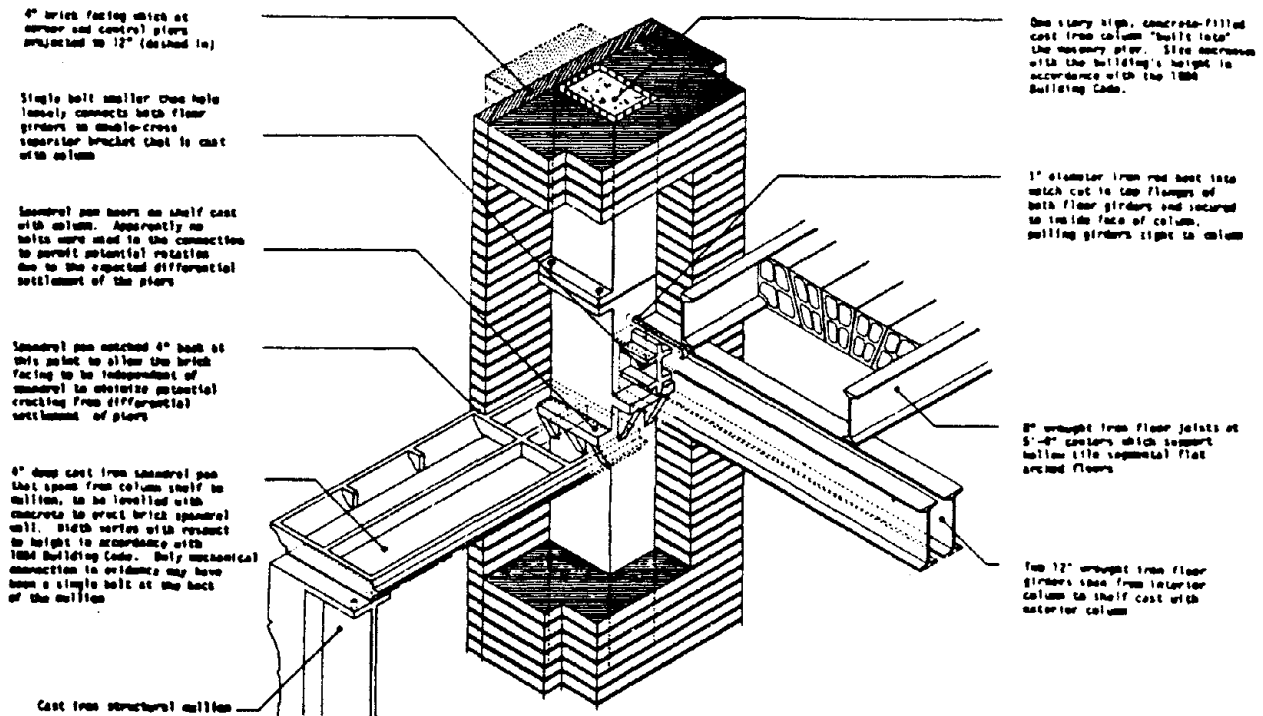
Beam-to-Column Connection of the Home Insurance Building (1885).
